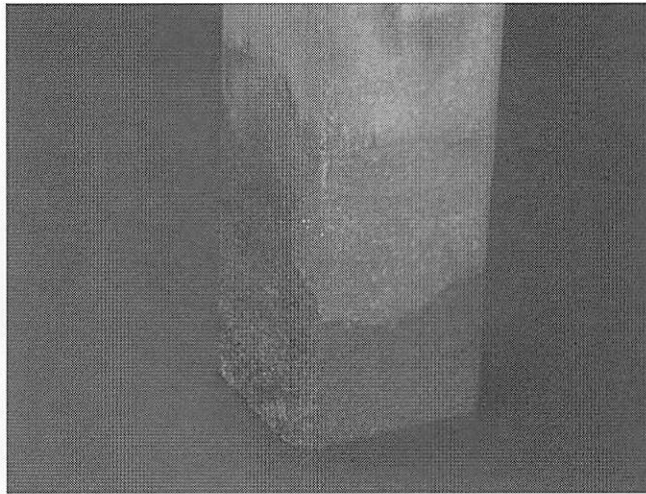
Portion of column damaged by sulfate attack and erosion
